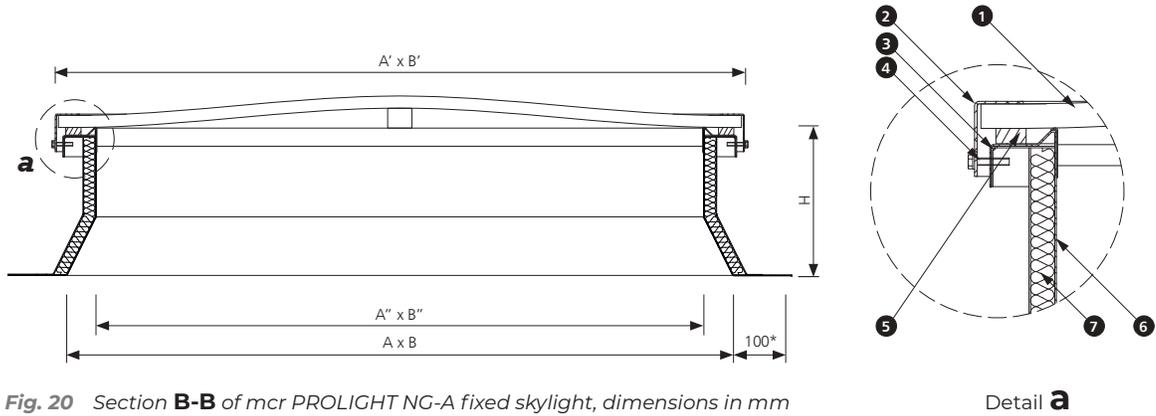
Section B-B of mcr PROLIGHT NG-A fixed skylight, dimensions in mm
